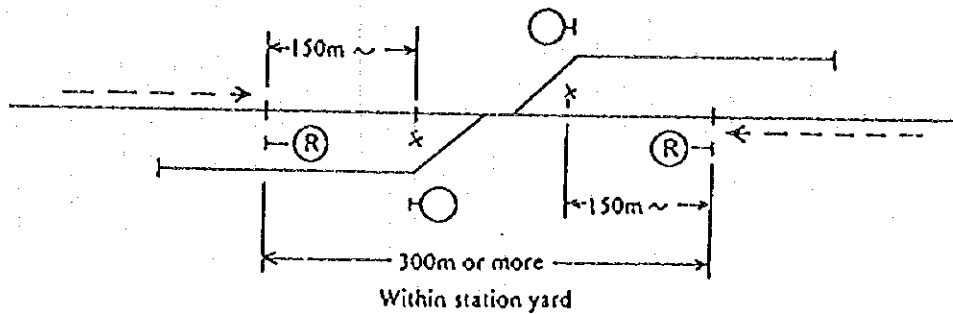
Interchange Station to be Constructed on Hai Van Pass
